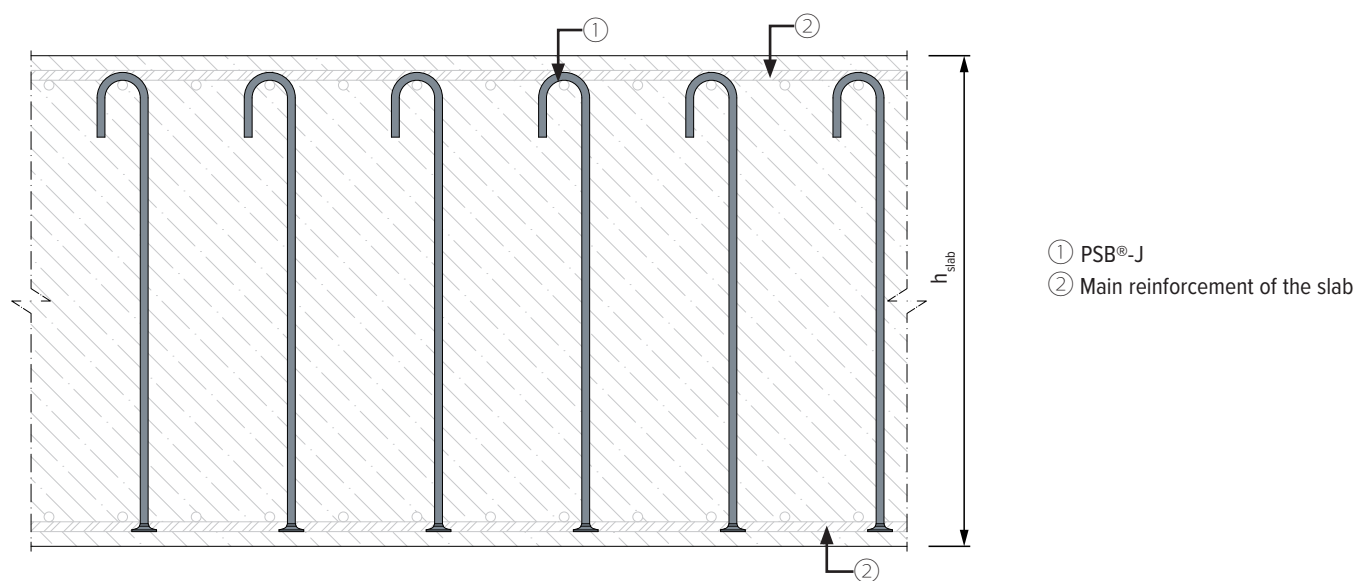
PSB®-J AS SHEAR REINFORCEMENT INSTALLED IN THE THICK SLAB
